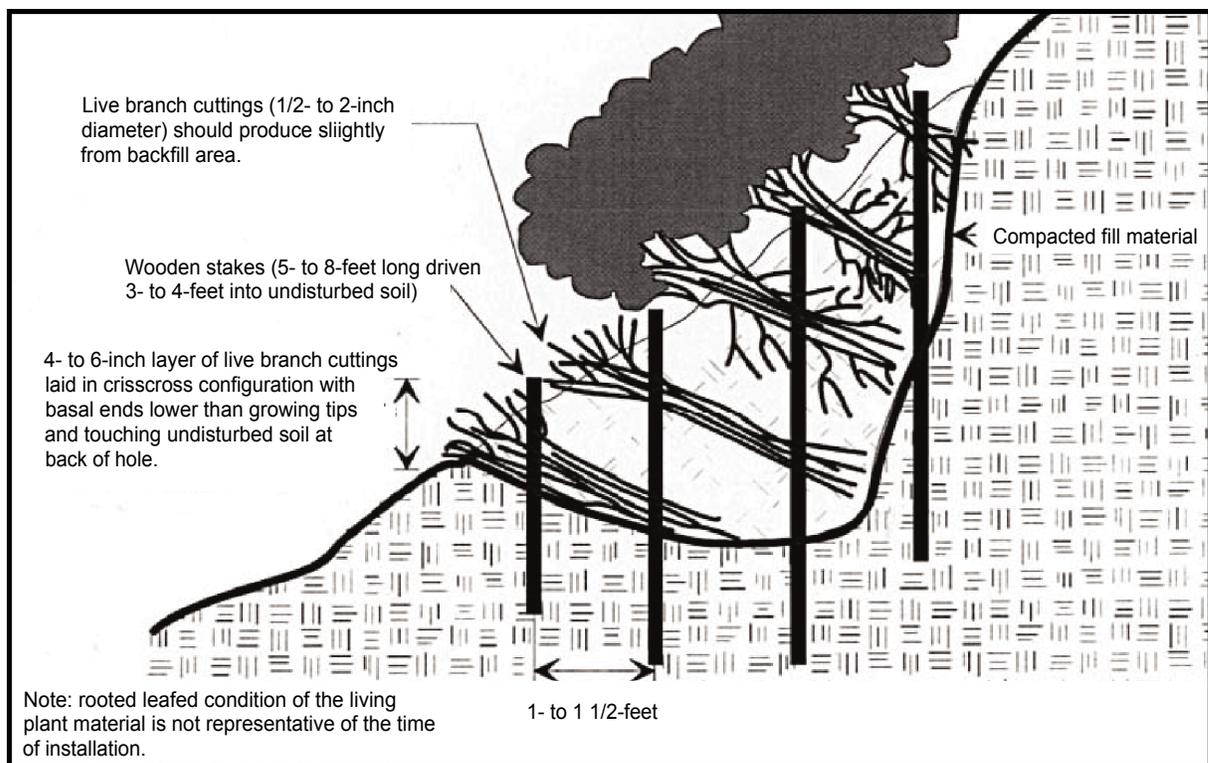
Typical branchpacking cross section. Source: *NRCS Engineering Field Handbook*, 1992.
